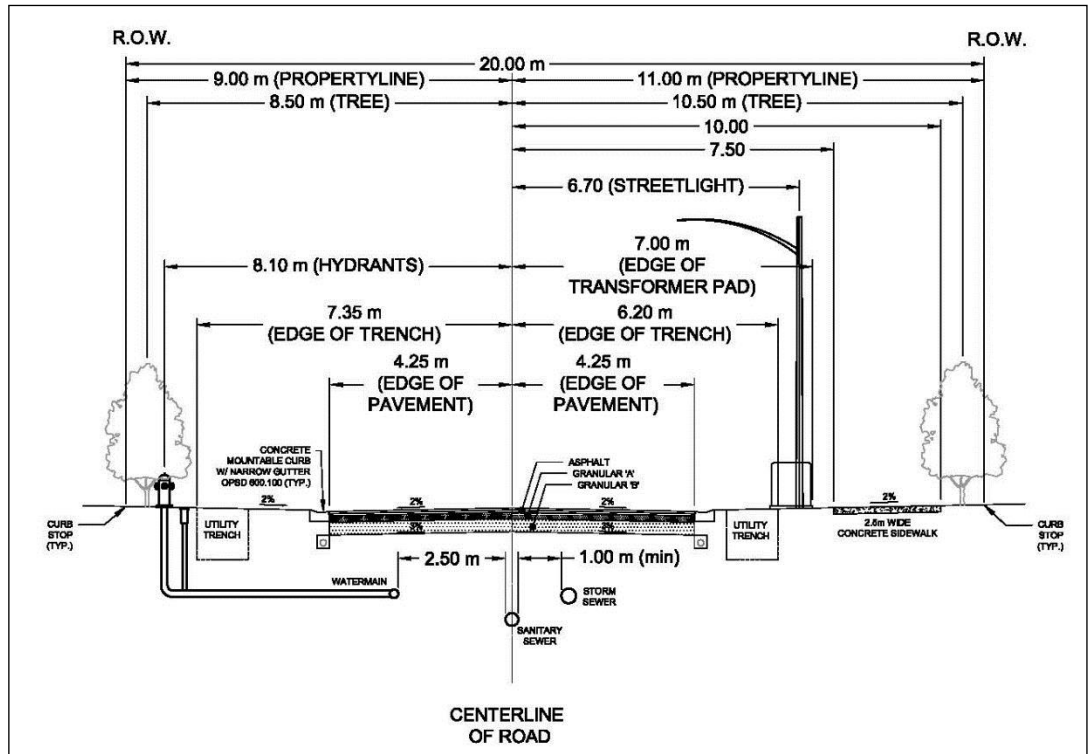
Sample cross-section of proposed "Minor Collector" road proposed for Streets 'B' and 'F' (IBI Group).
